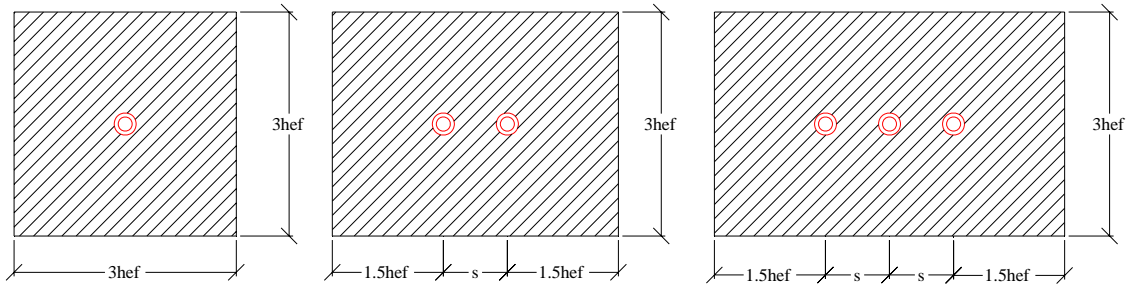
Concrete breakout – projected failure areas for specimens with no haunch (A_{Nc})
